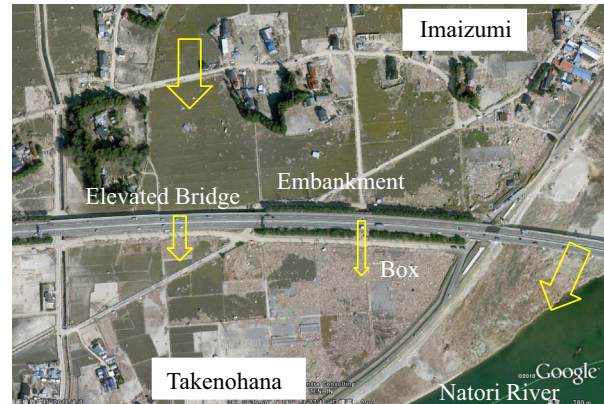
Overview of highway embankment on April 6 (Takenohana and Imaizumi).
